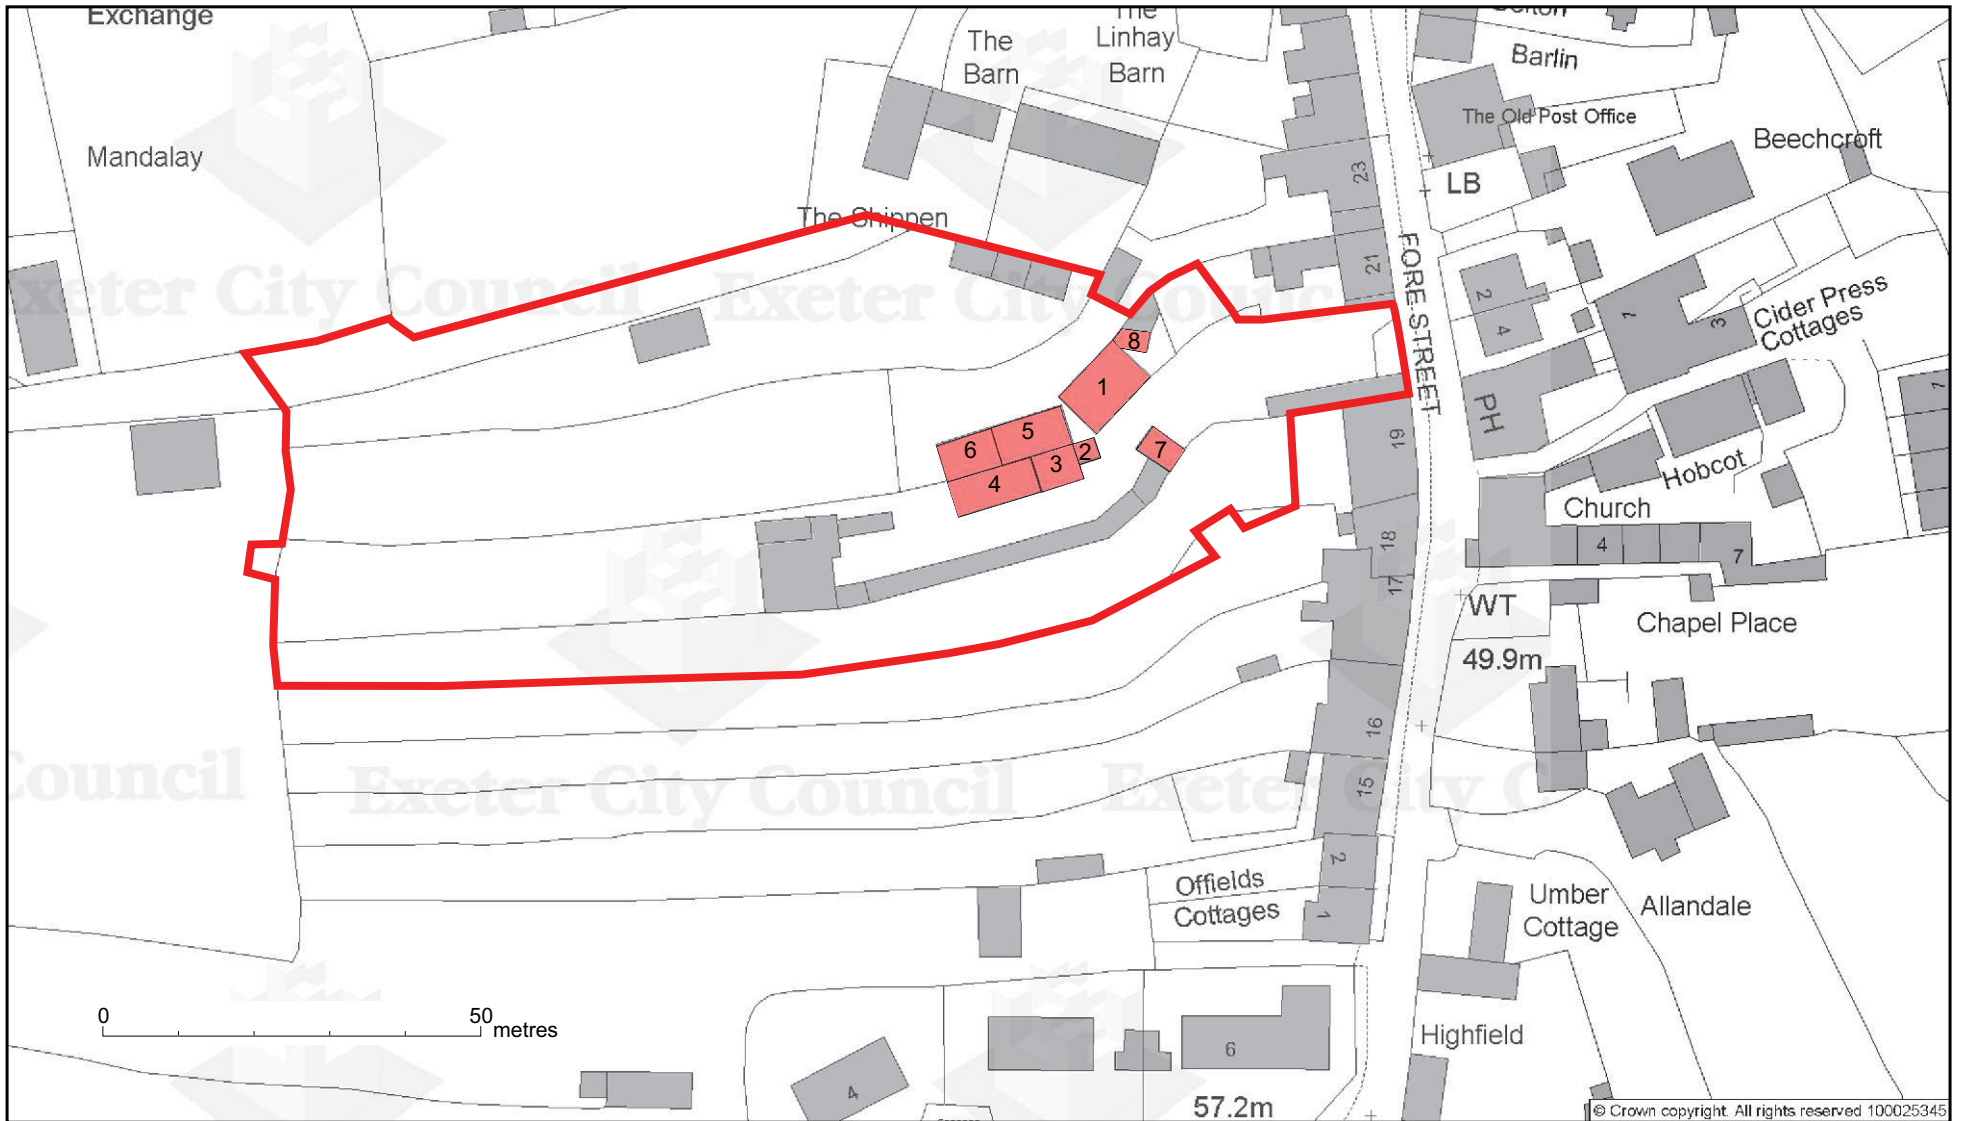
Site area and location of recorded buildings (numbered 1-8).
